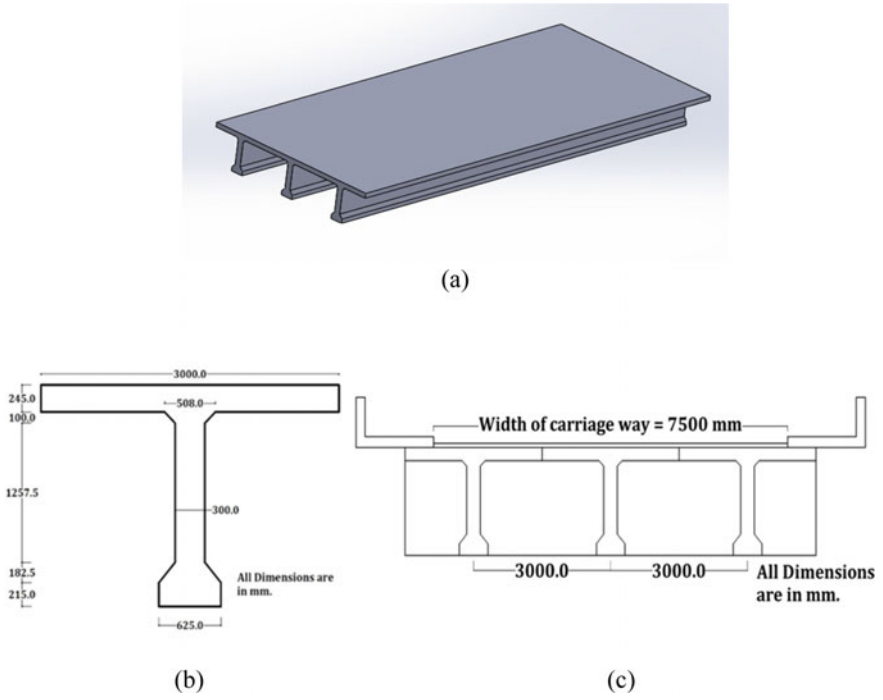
T-beam slab bridge: a panoramic view b cross section of one T-grider c cross sectional view of the bridge
